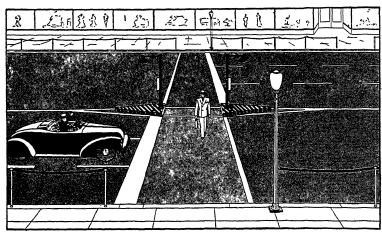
It is often desirable to provide pedestrian crossing places in the mid-block or at locations other than intersections. Extreme care should be taken to make these locations quickly and clearly recognizable to drivers, both day and night. The drawing above suggests a design for a mid-block crossing with a pedestrian island. Note chain barriers along the curb, the width of the near crosswalk line, and lighting features on the island and sidewalk. The illuminated signs on the lighting posts of the islands are of standard warning shape and carry such lettering as "CROSSWALK."
